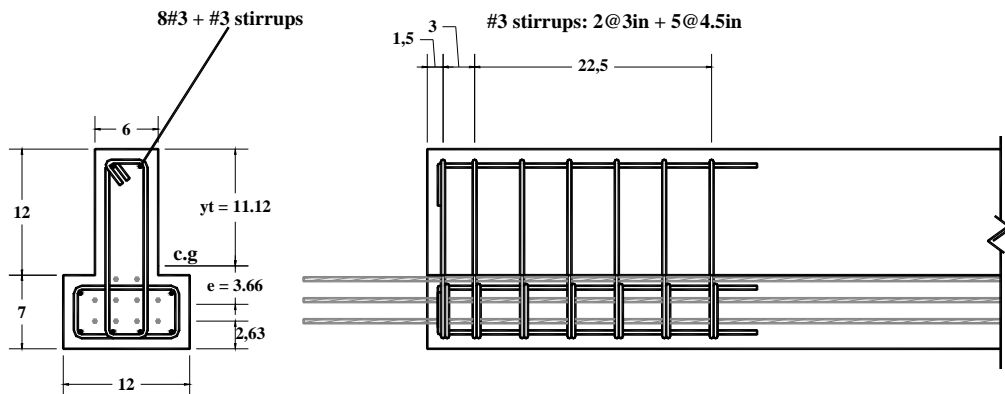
Inverted tee beams without top nonprestressed reinforcement
